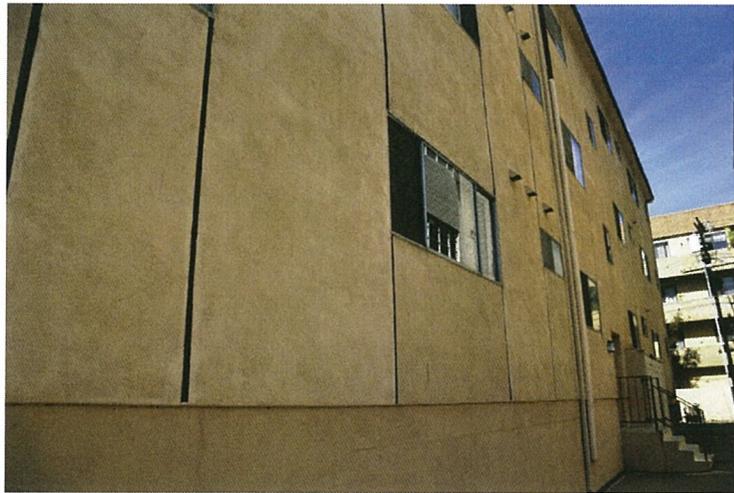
North façade of 429 N. Palm Drive with stucco reveals, horizontally-oriented sliding windows, and an exterior stair, looking west. Source: Page & Turnbull, 2014.
